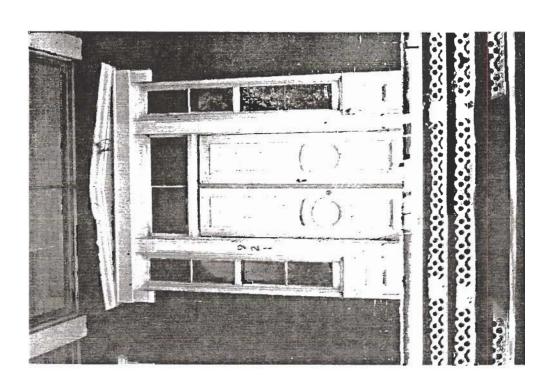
South Entrance Wood Door and Sidelight Elevation.
